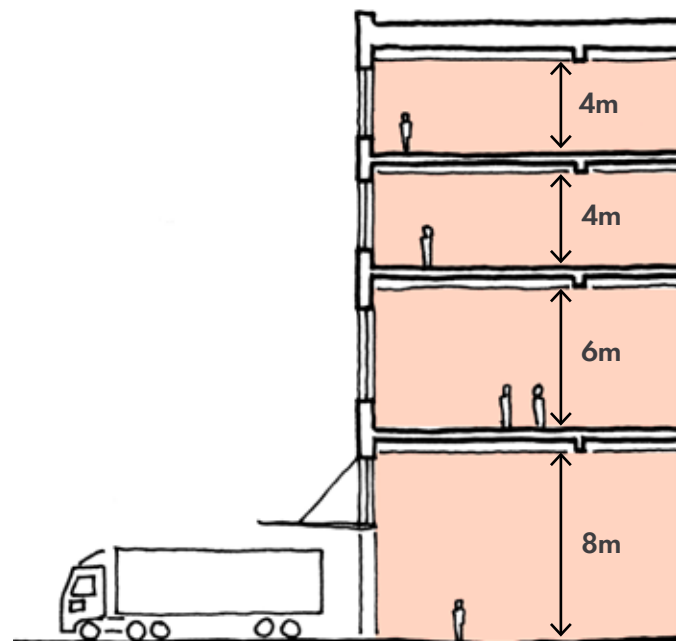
Indicative section through a stacked industrial building showing the clear floor-to-ceiling heights needed to deliver high quality space
